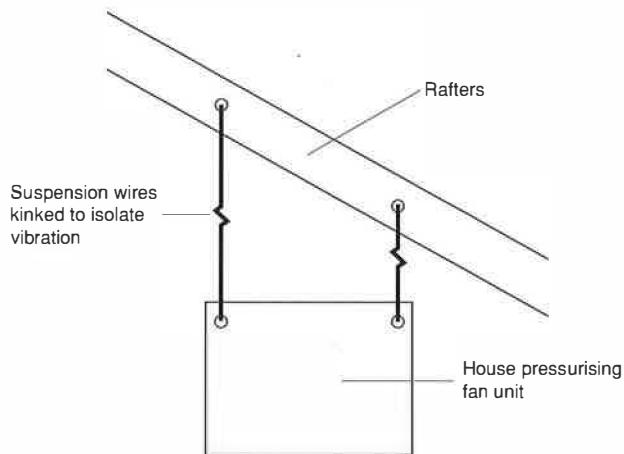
Fan unit suspended from roof structure (typical arrangement)
